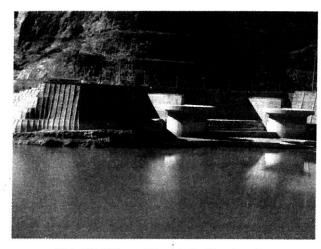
A View of the Intake Structure for The Tunnel Spillway
